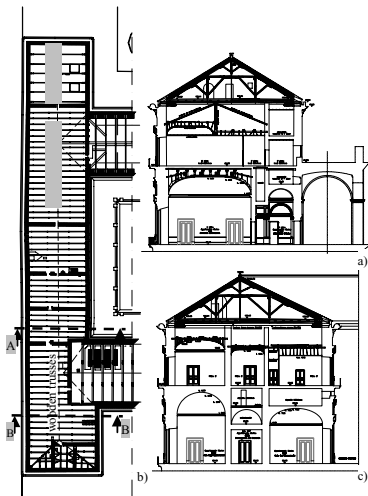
The north-west wing: a) Roofing floor; b) Section A-A; c) Section B-B.
